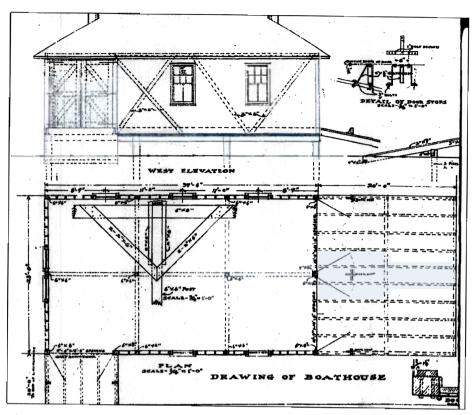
Original drawing of west elevation of boathouse (Source: Coast Guard Academy Library)
